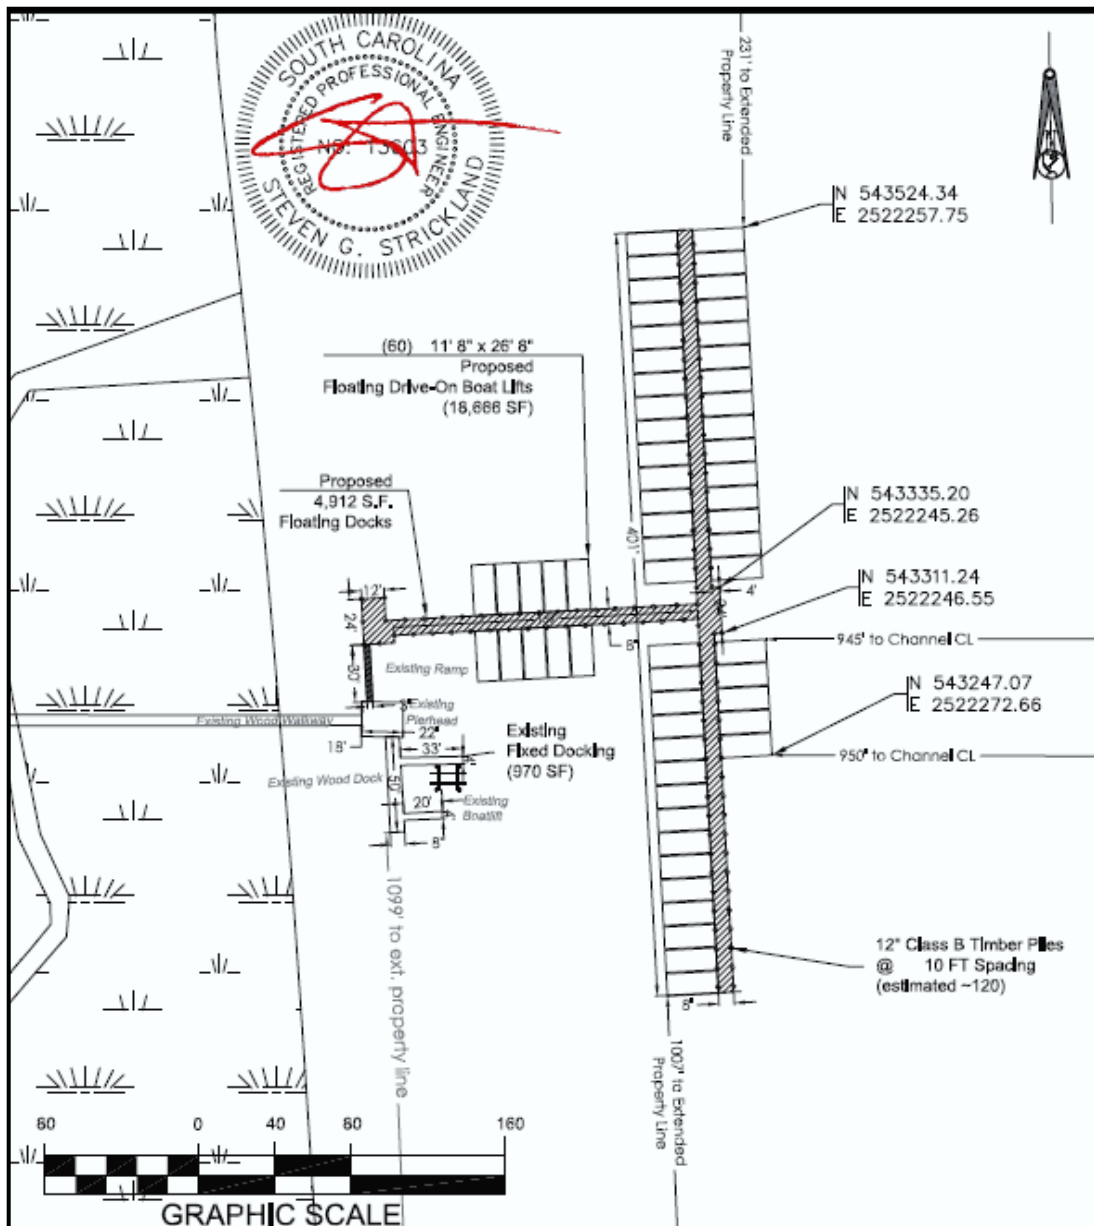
Proposed marina improvement plan (Courtesy of TEG).
